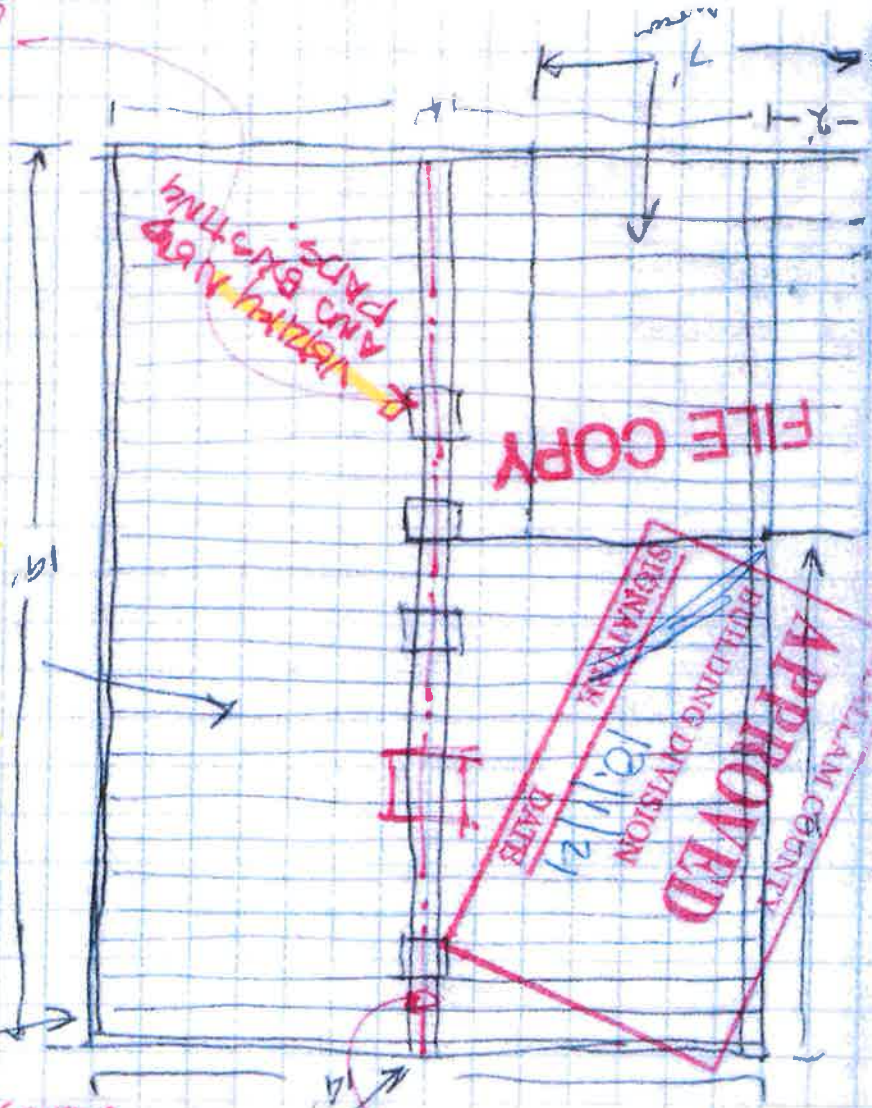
FOUNDATION PLAN FOR IMPROPER SECTION OF HOME
